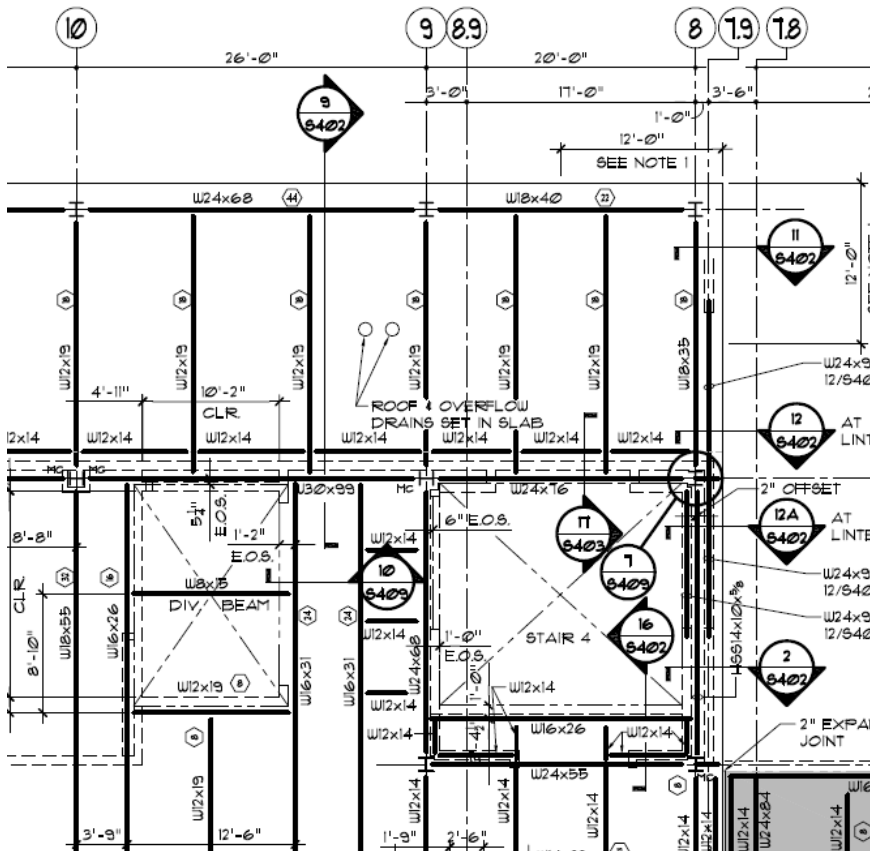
Partial plan showing the second floor, northeast corner of the west wing
